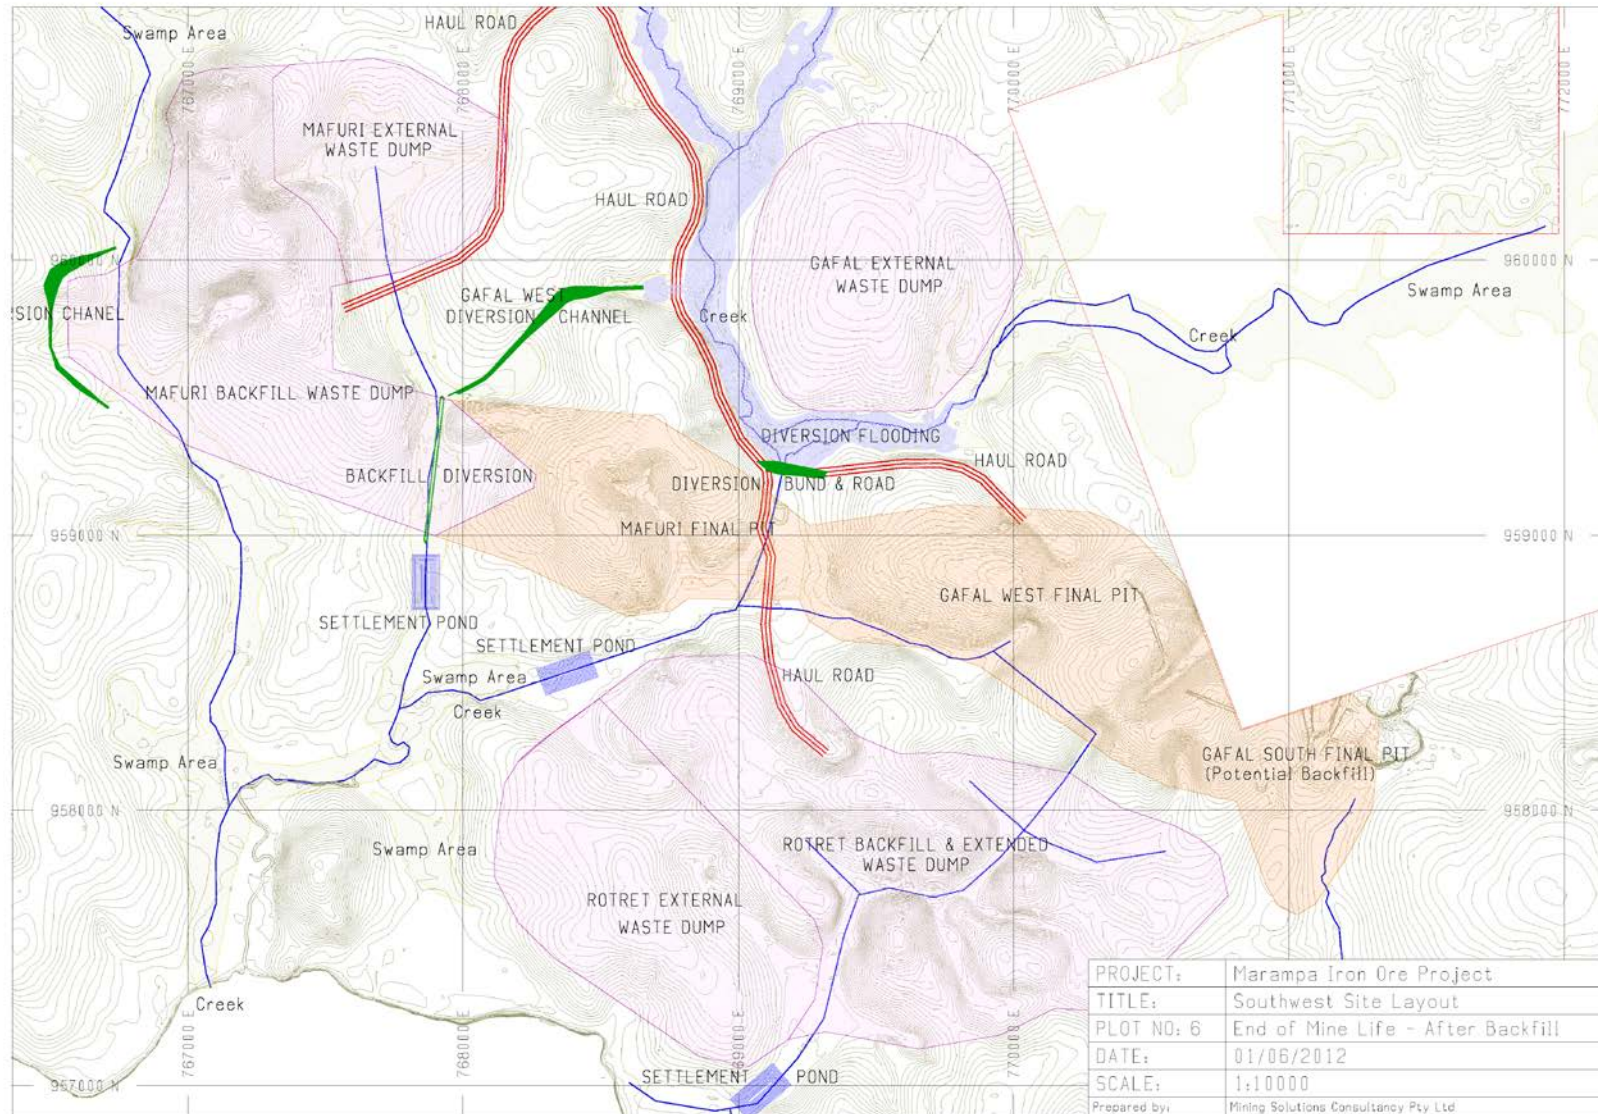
Layout at end of mine, showing backfilled pits and preliminary surface water management design
